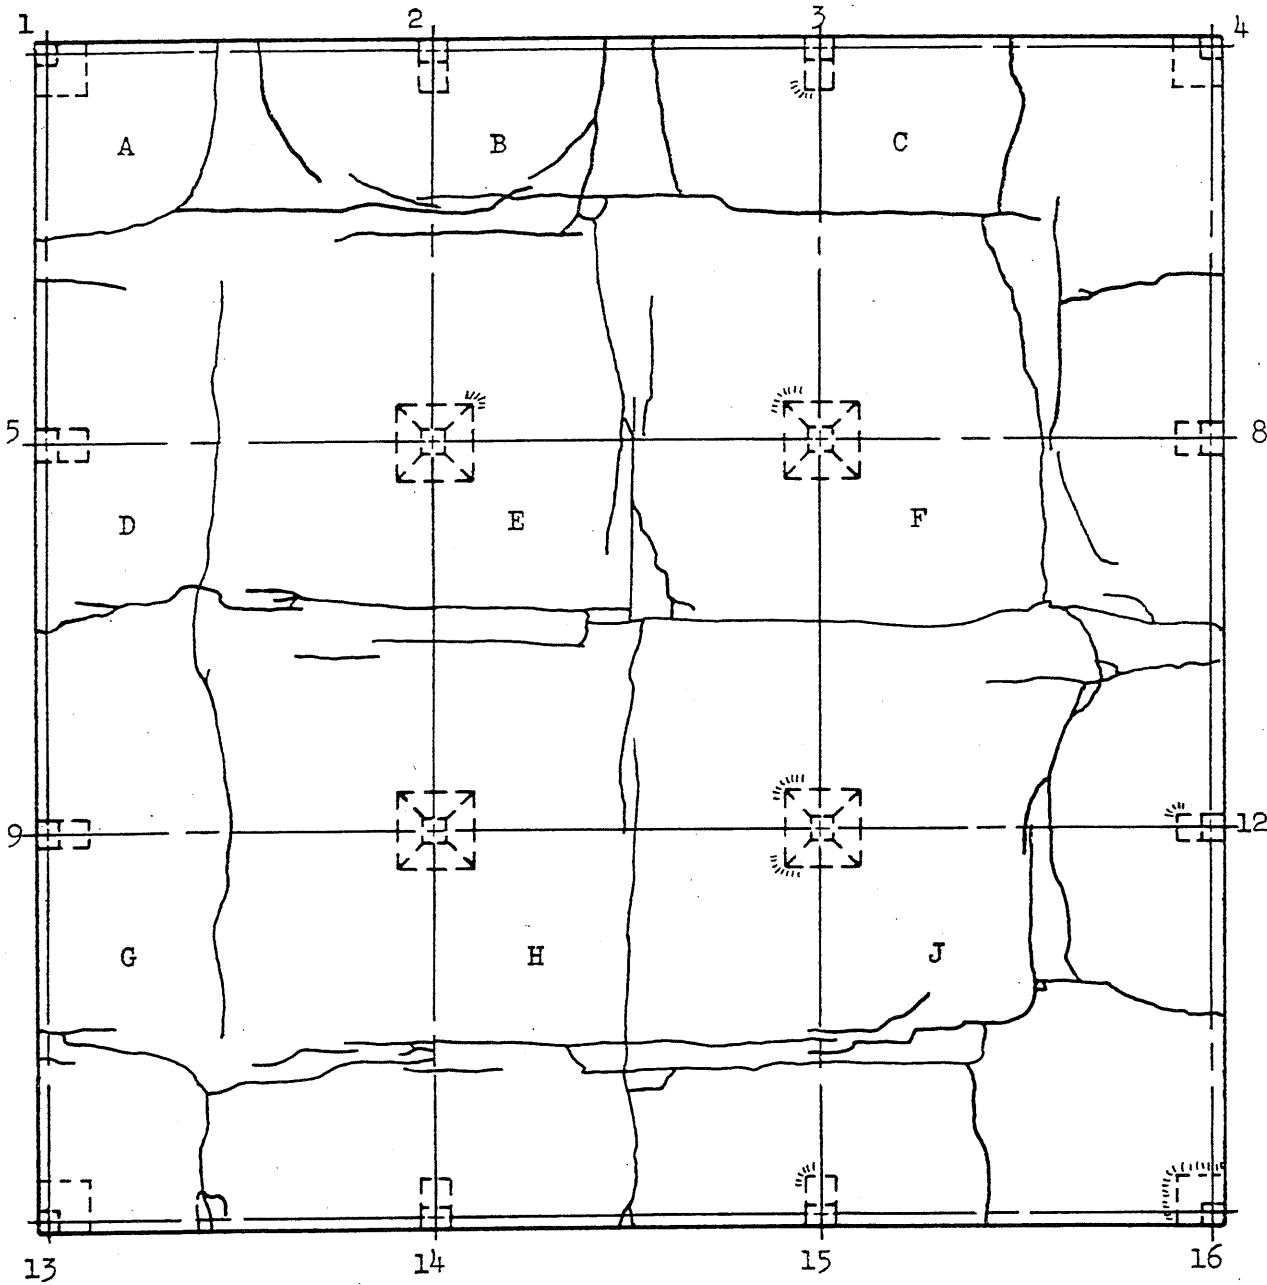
CRACK PATTERN ON BOTTOM OF SLAB F6 AFTER TEST TO FAILURE
